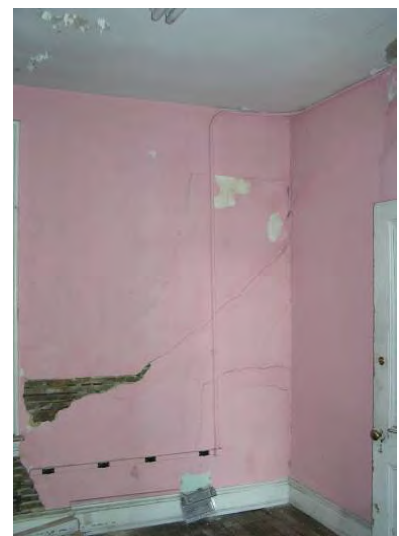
Room 305 - Diagonal cracks, west wall. (RSA, 2006)
